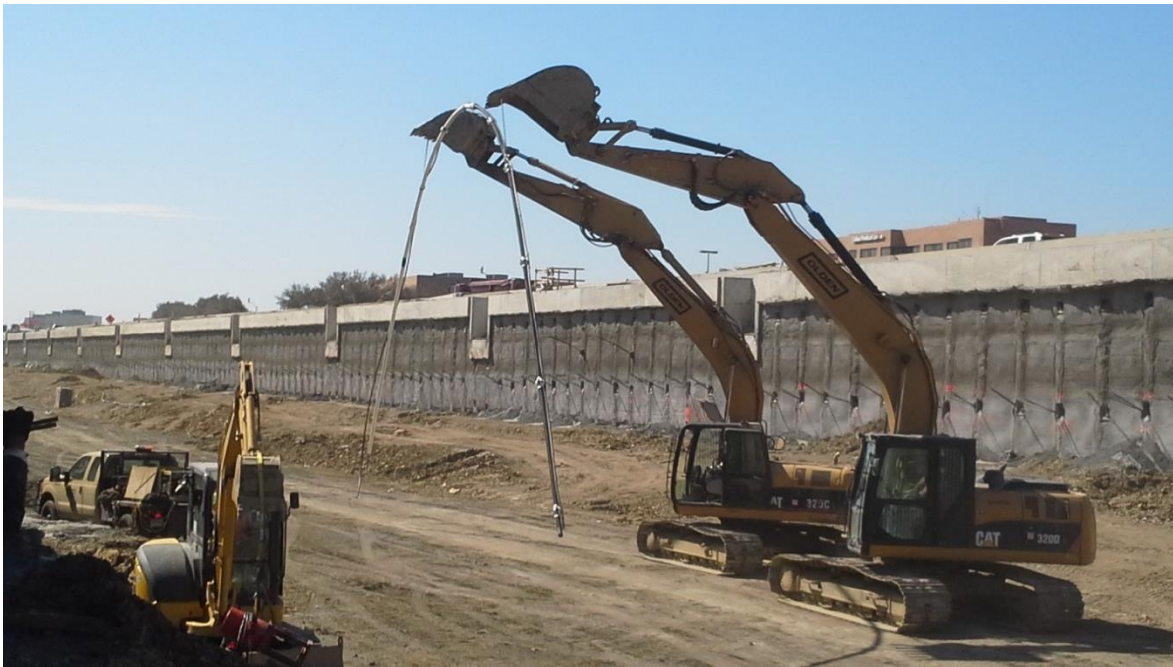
Two excavators handling a steel bar anchor longer than 60 feet
